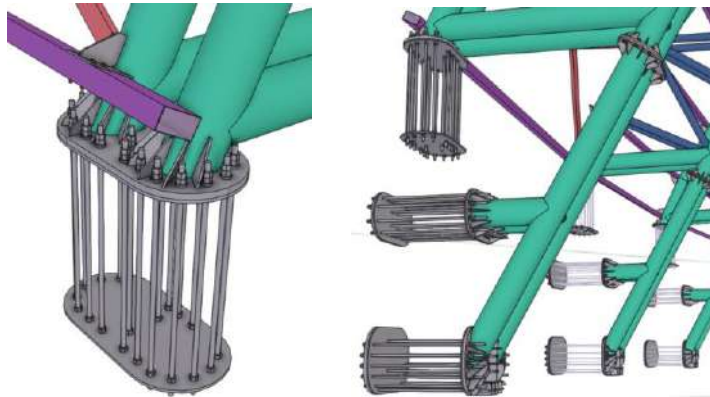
Base plates, backing plates, concrete anchor templates and anchors
